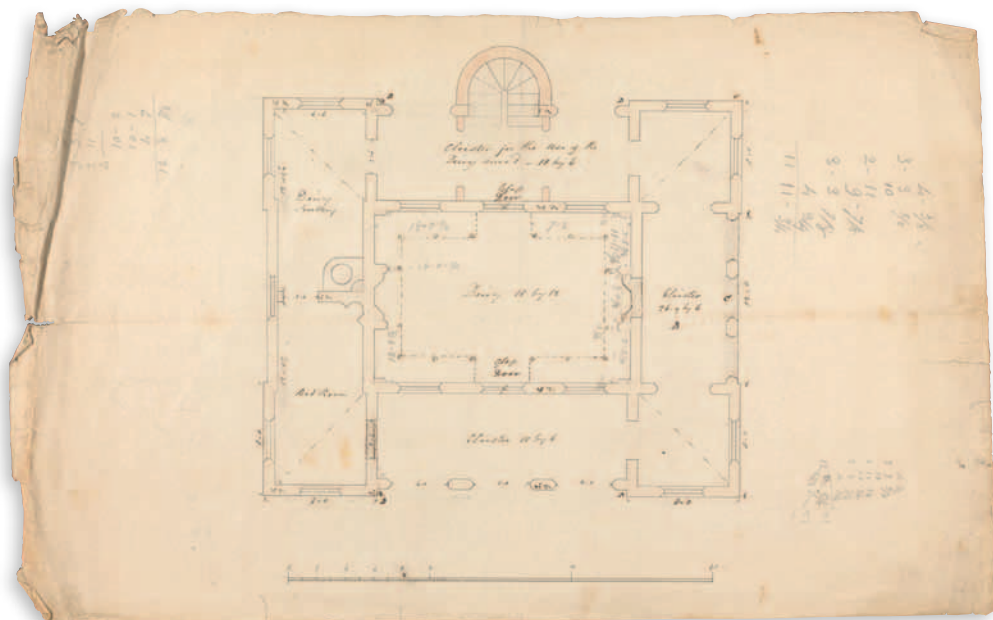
Detailed floor plan of the Dairy, showing room functions, features and measurements. The steps to the cellar are also shown. (Yale Center for British Art, Paul Mellon Collection, B1977.14.797)
